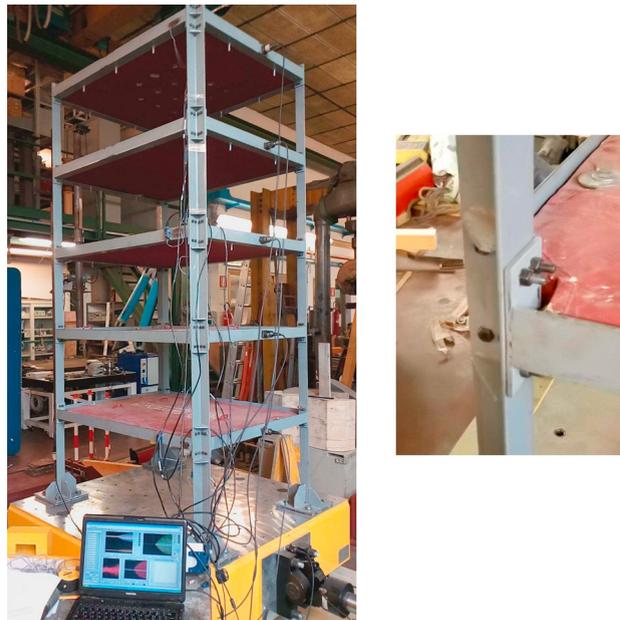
(a) Lab-scale structure with first instrumentation configuration; (b) Bolted joint.
